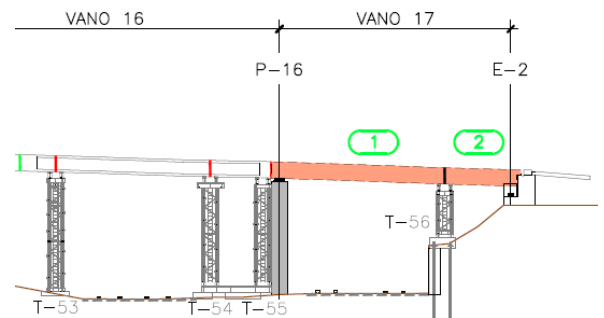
Phase 16: Disassembly of span 17 over railway line.
